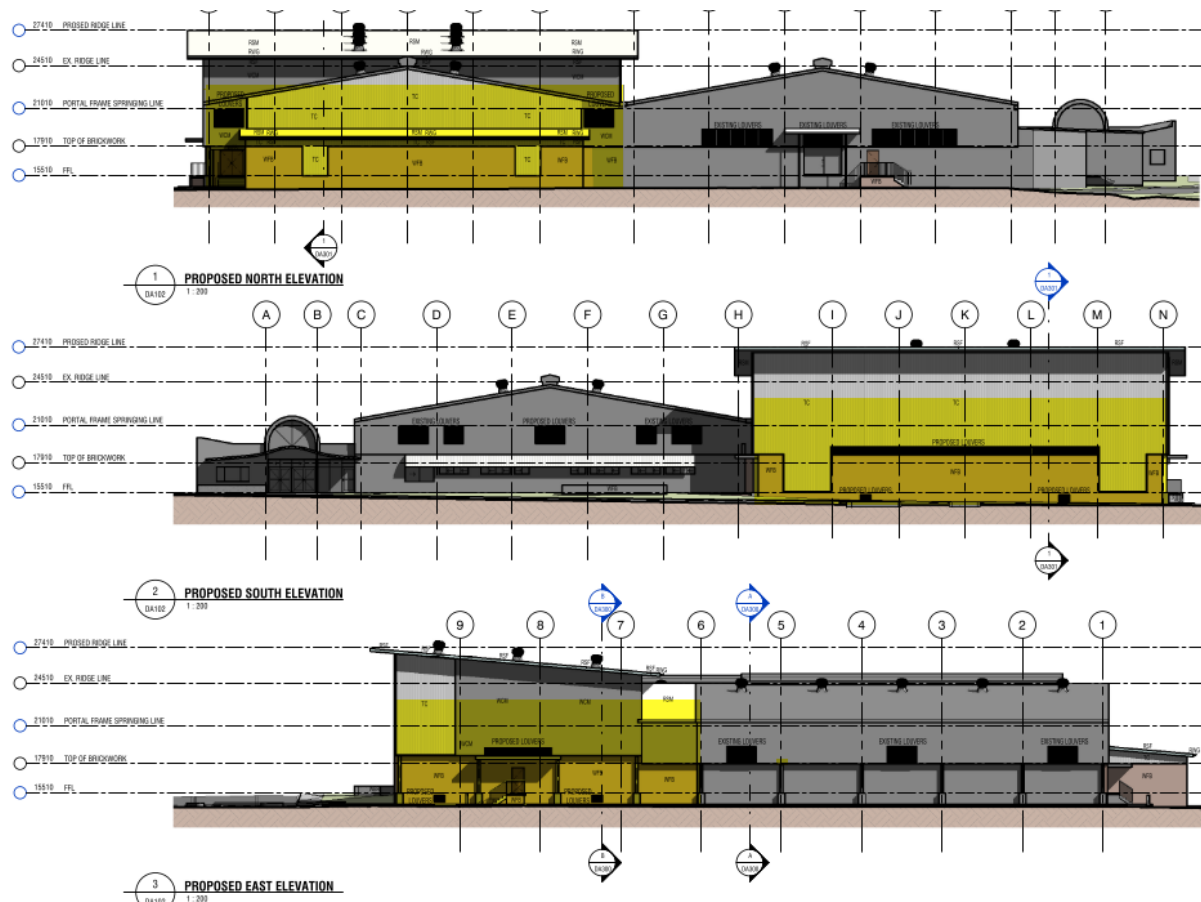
Elevations (Approximate 8.5m height limit for additions indicated in yellow)
